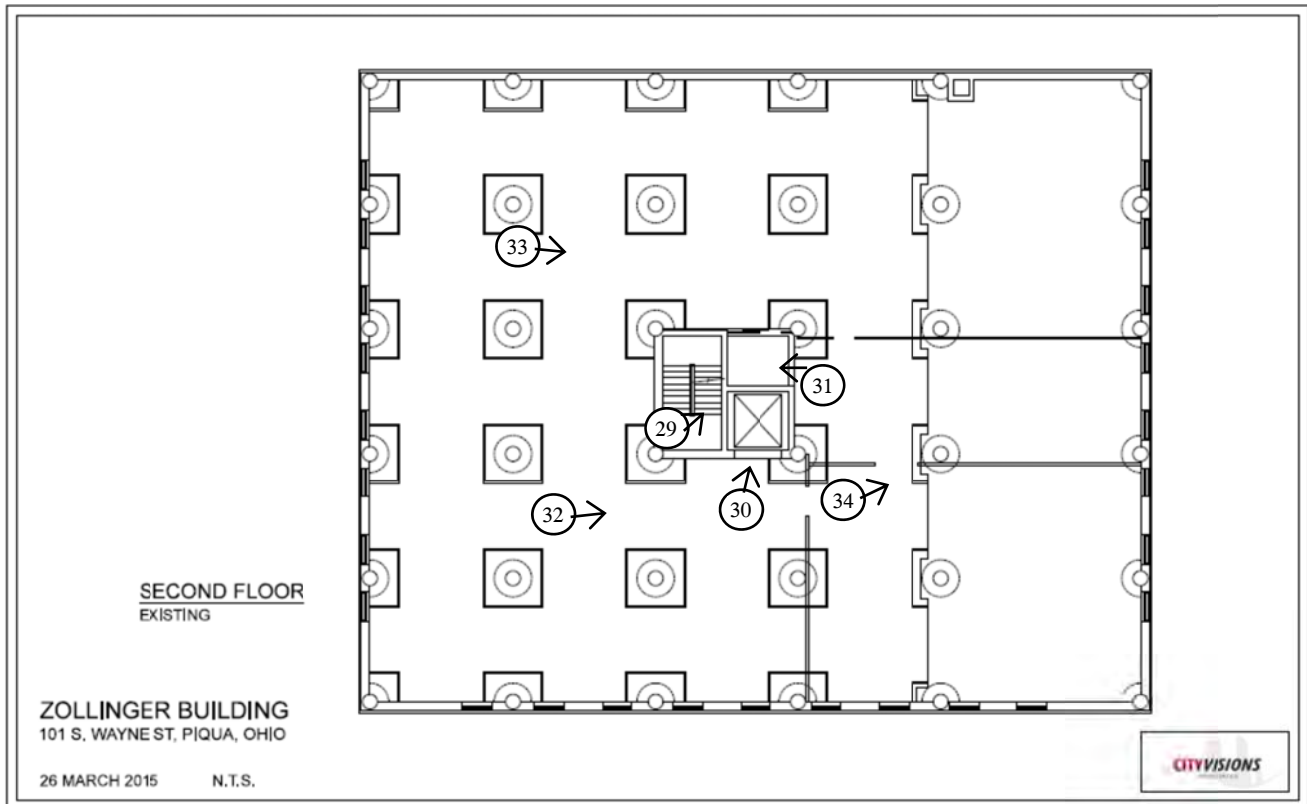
Existing Second Floor Plan, Zollinger Building showing locations of photographs 29-34 (City Visions, Inc.)
